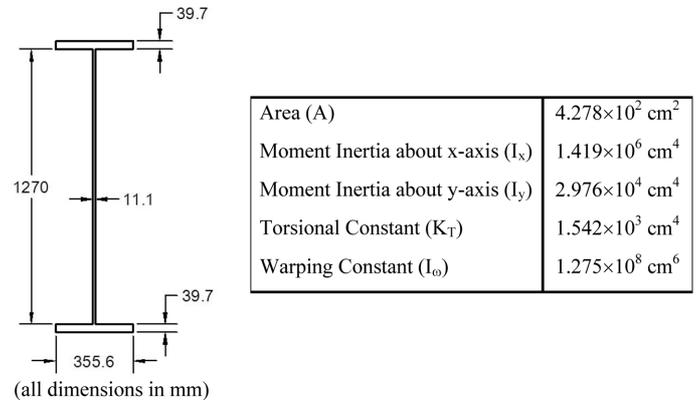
Cross-section of the girder used by Yoon *et al.*(2005)
